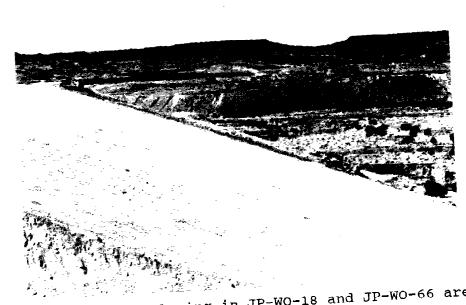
Dozers sloping in JP-WO-18 and JP-WO-66 areas (northwest Jackpile, looking SW).
